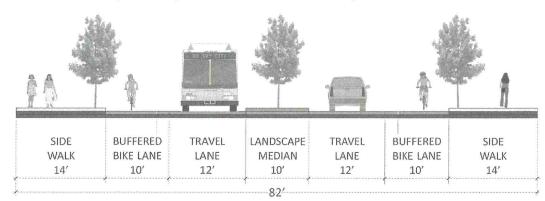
Bicycle- and pedestrian-oriented roadway cross section.
